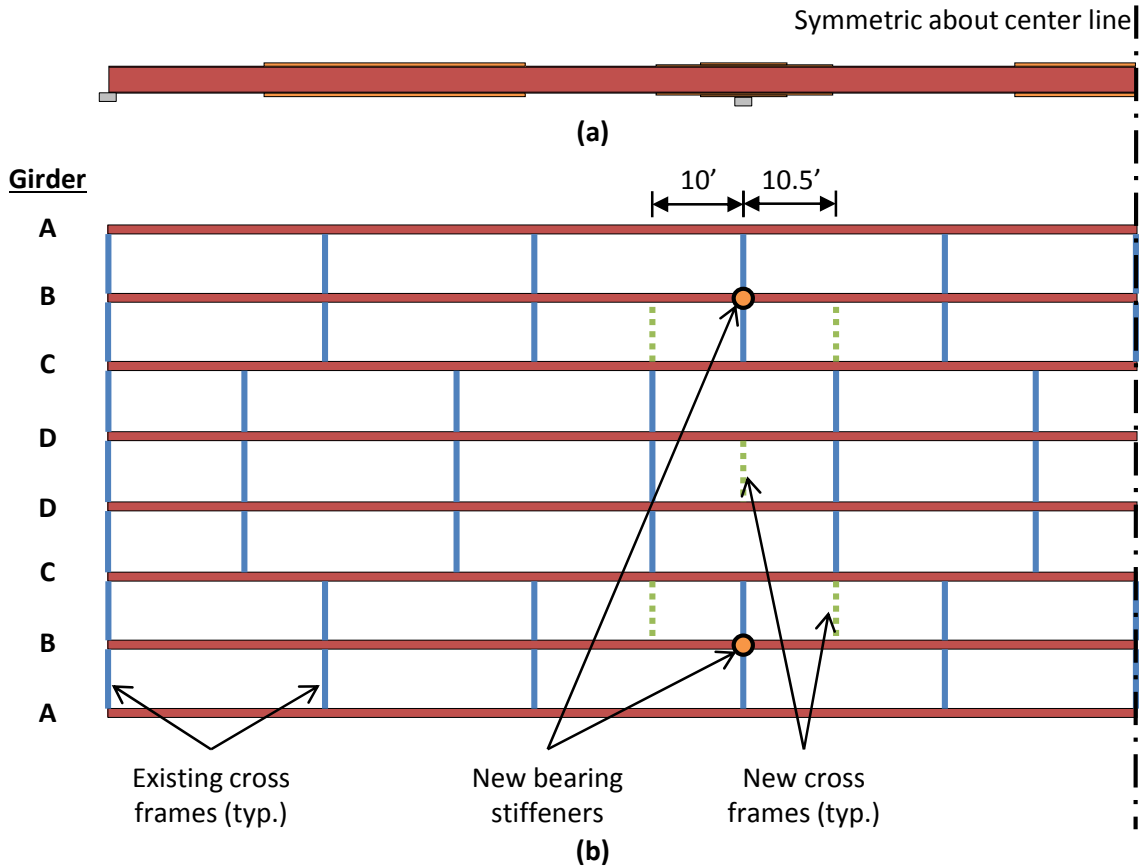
Suggested Locations of New Cross Frames and Bearing Stiffeners Required for Moment Redistribution – (a) Elevation View and (b) Plan View of Girders
